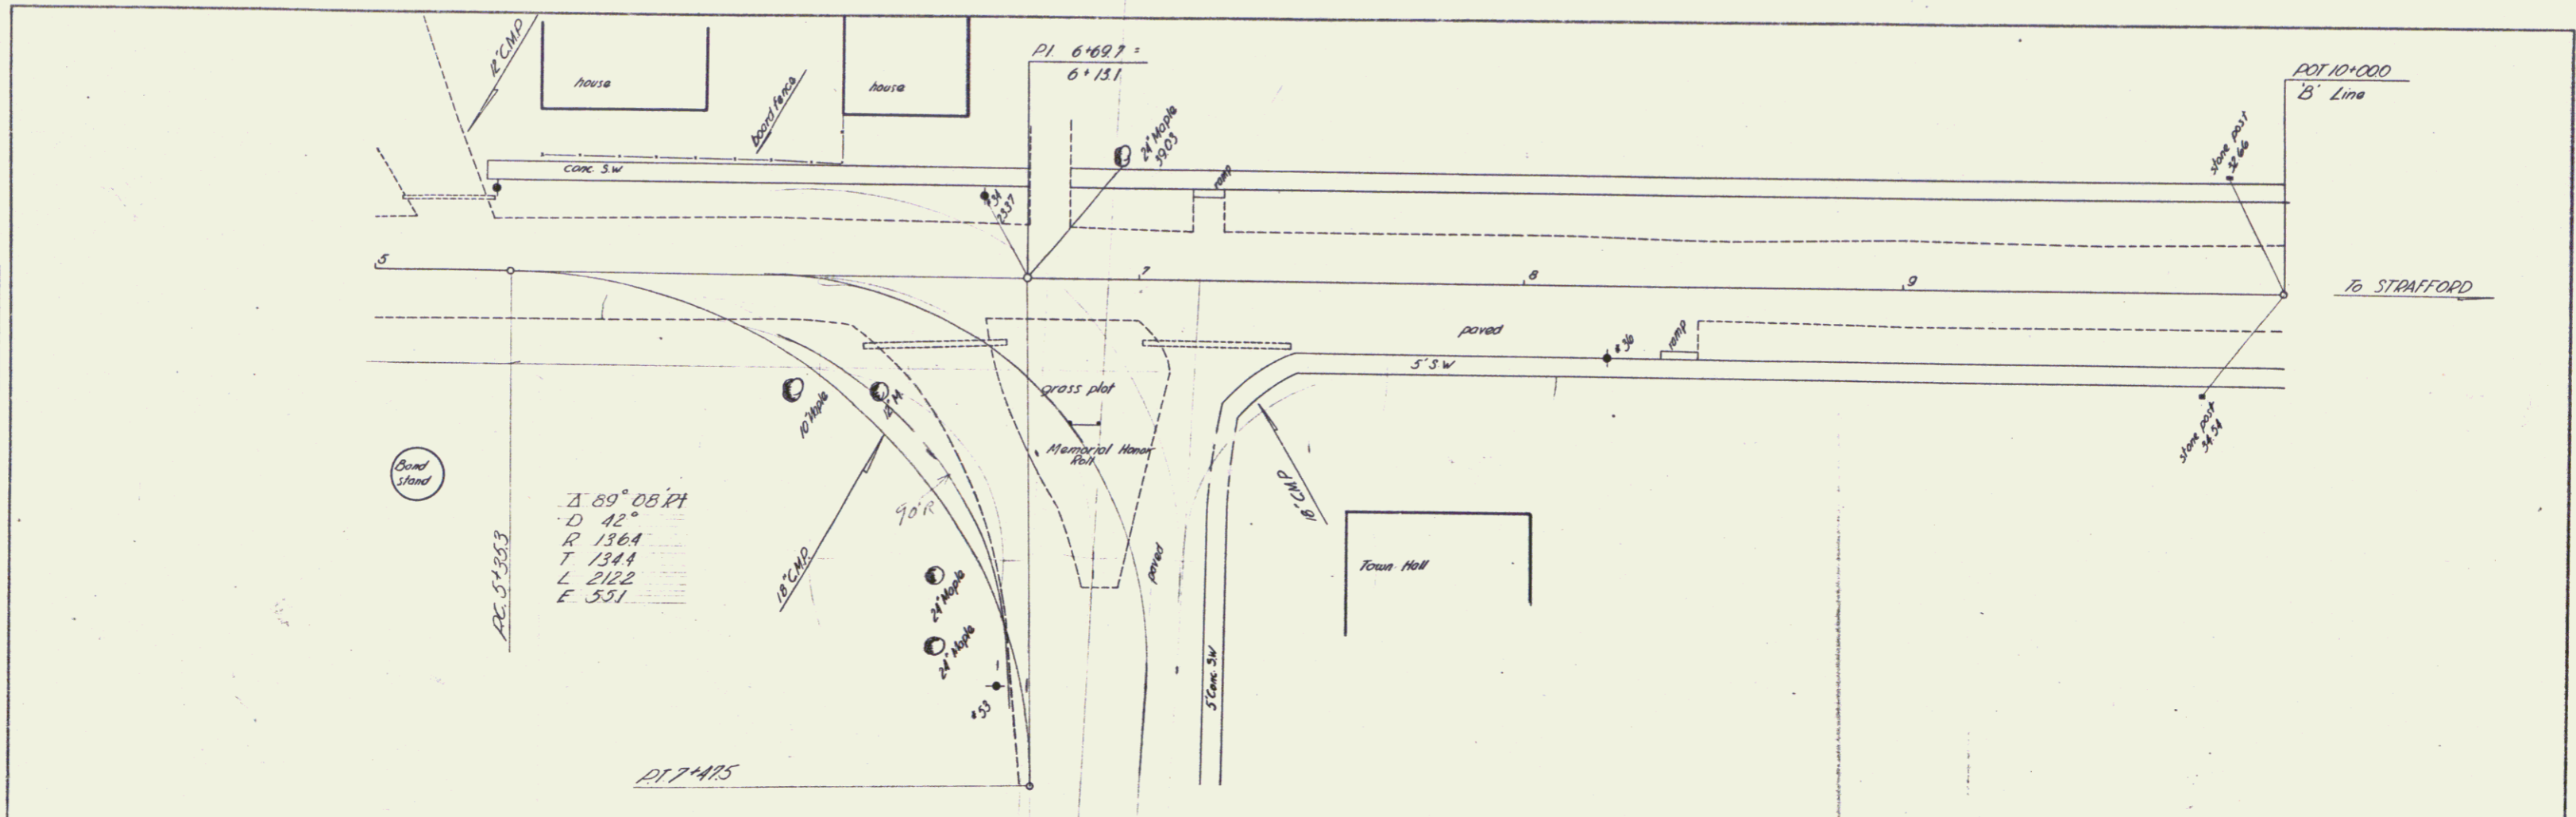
PLAN - PROFILE OF P.A.R. & E. STAMM
